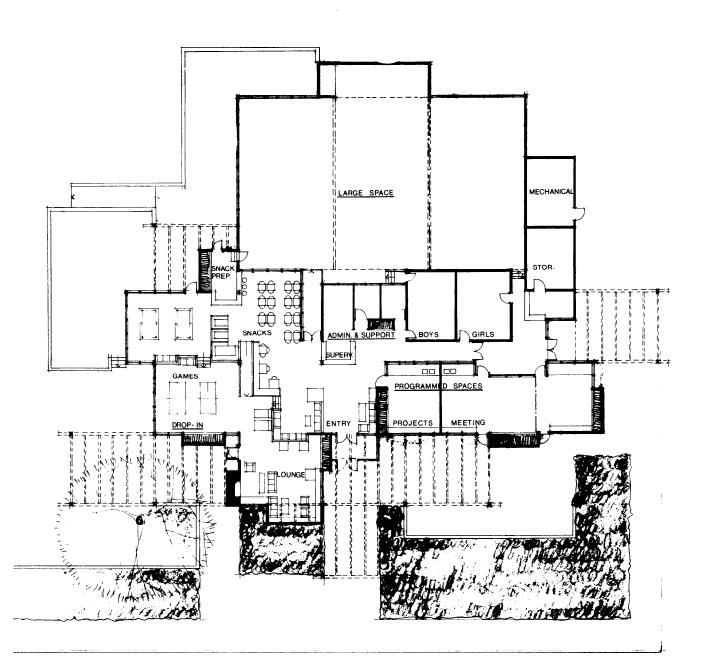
Medium-sized Main DYAC: Floor Plan
